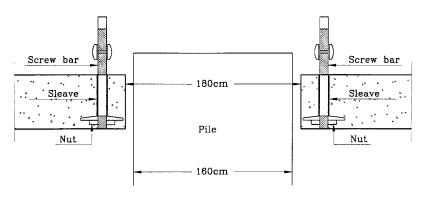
Details of Anchorage of Screw Bars to Bottom of Pile Cap
